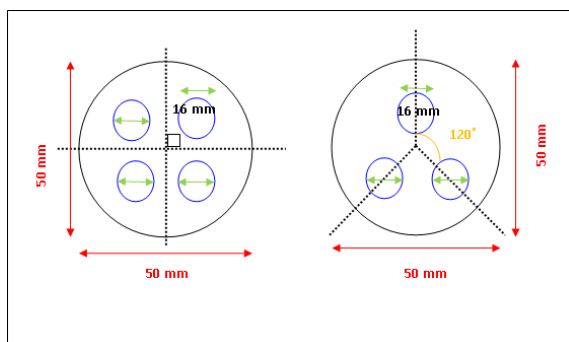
Detailed Columns Arrangement for 30.72% and 40.96% Area Replacement Ratio
